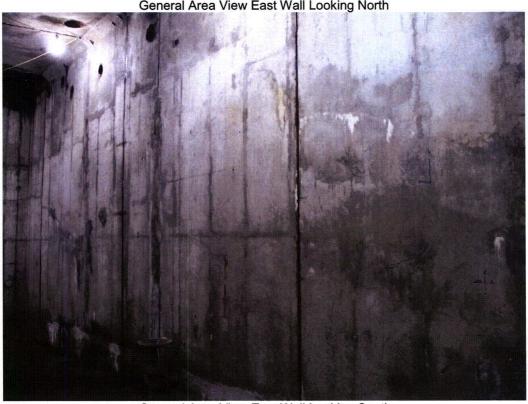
, Views of SEB Cooling Tower Basin CPT Walls (Survey Unit SE-3-28)
